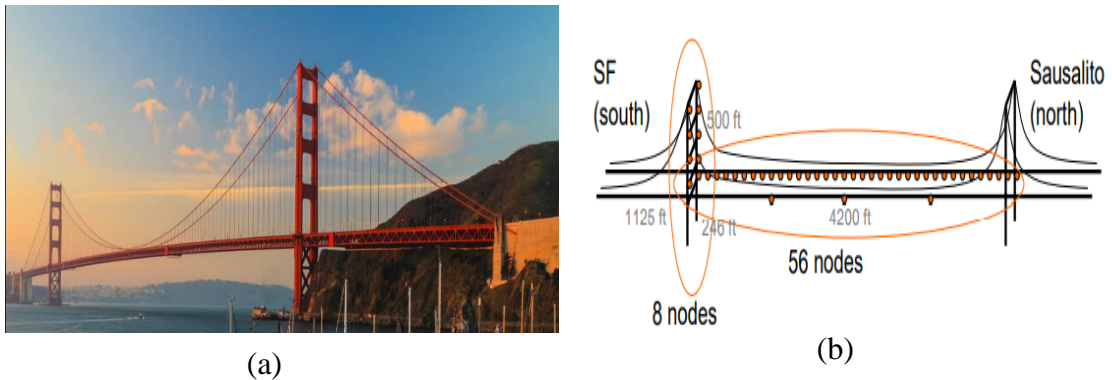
(a) Golden gate bridge (b) location of sensors throughout the bridge. Source: [25]
